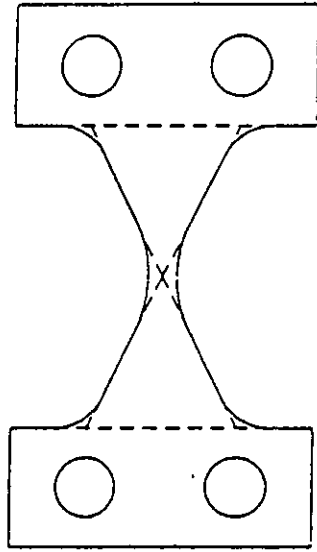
ADAS Element and Installation Detail (from Whittaker 1989).
